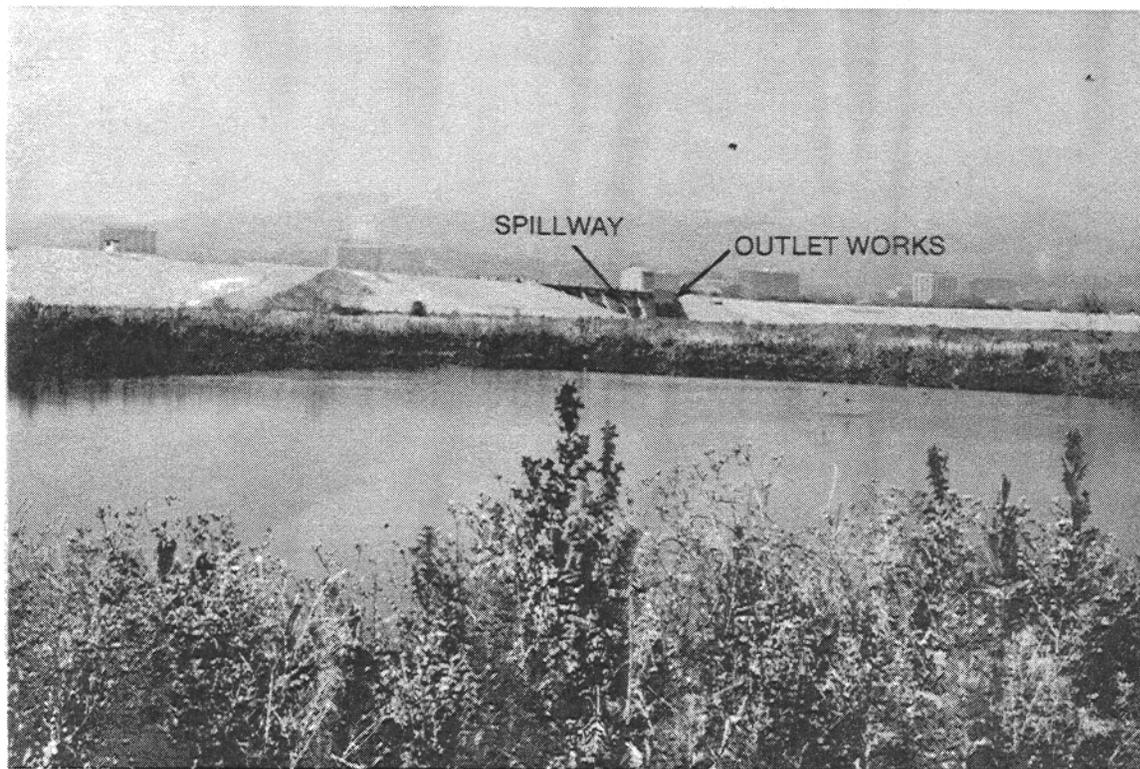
Wildlife Pond (view from within reservoir, looking downstream toward southeast).
